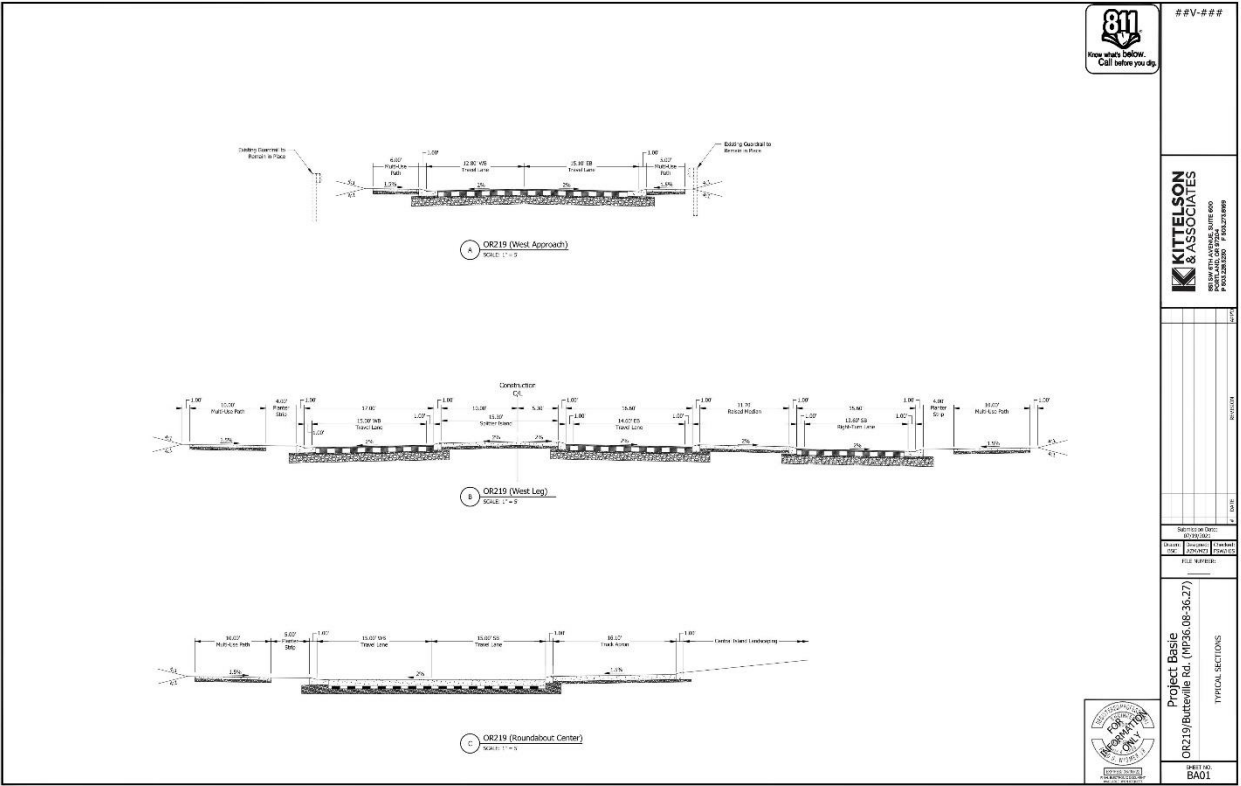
Preliminary OR 219/Realigned Butteville Road Design, Cross Sections, Lighting, and Old Butteville Road Closure Details
